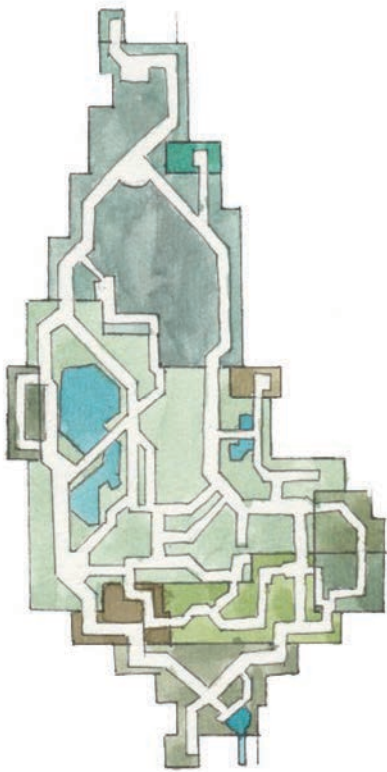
Princess of Wales Conservatory floor plan (Author's own drawing)
